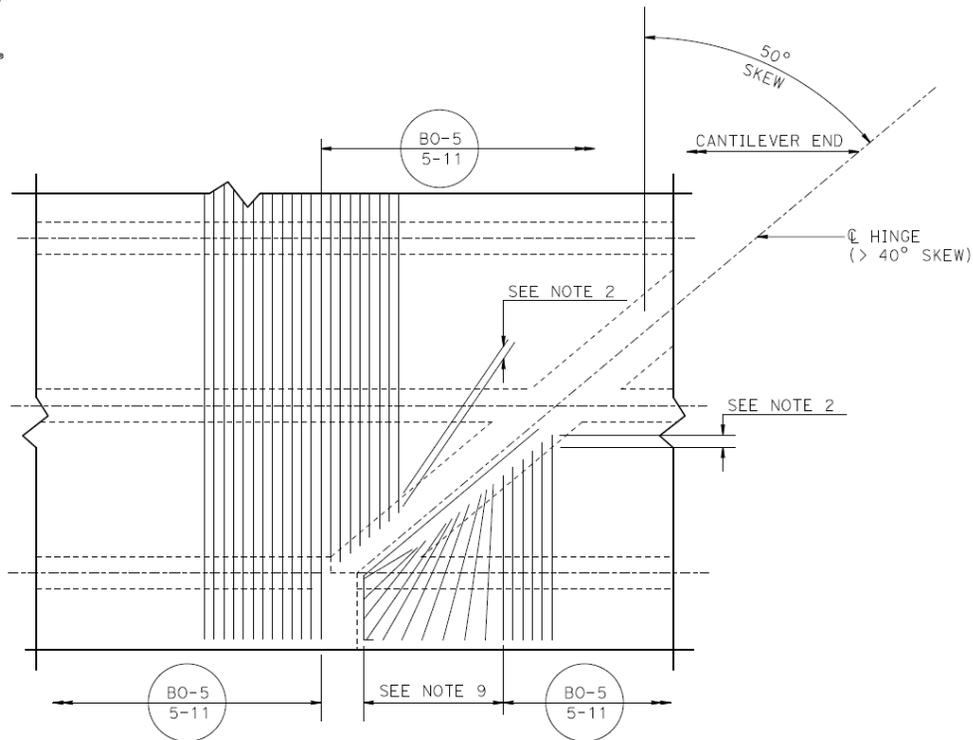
Transverse Deck Reinforcement Details at Hinge (> 40° Skew)
